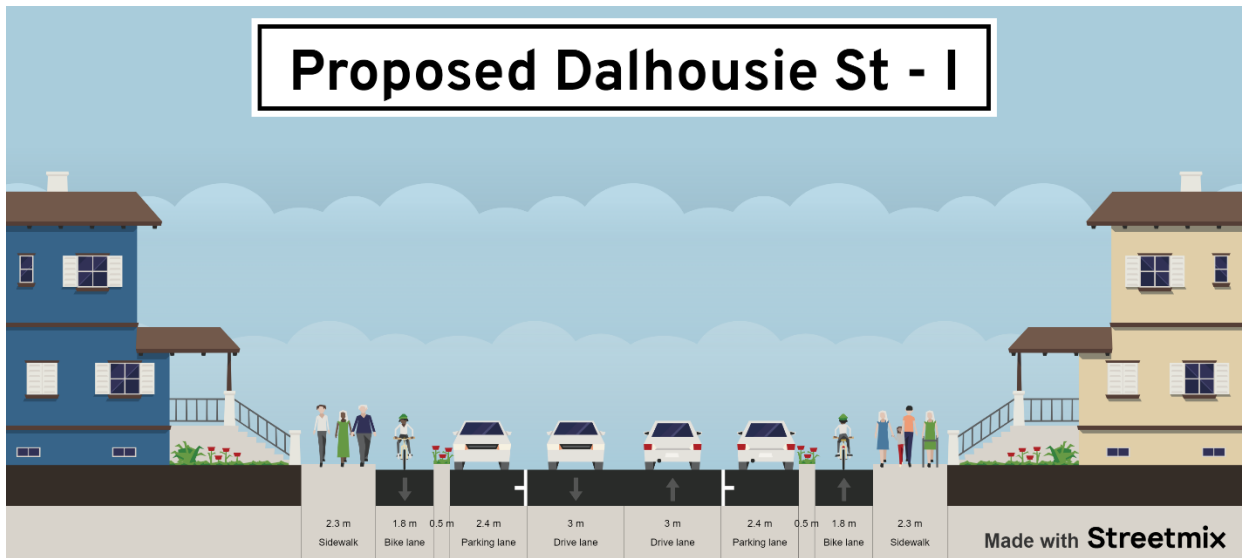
Proposed Dalhousie St Cross-Section between North Street & Rankin Avenue
